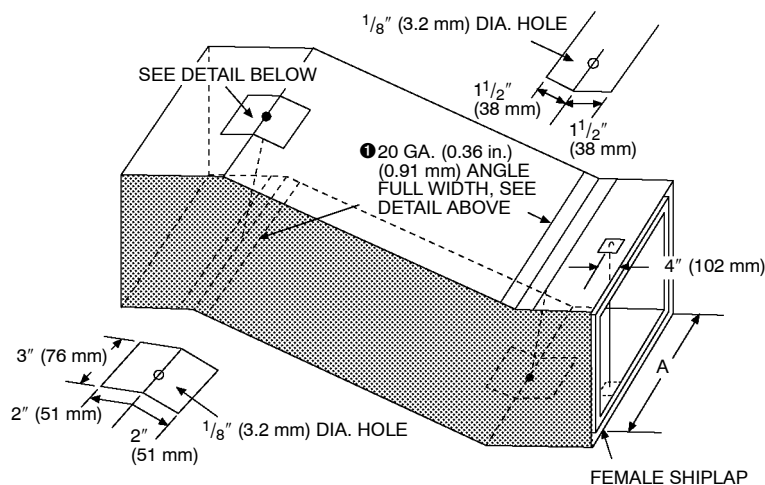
OFFSET REINFORCEMENT WITH SHEET METAL PLATES AND TIE RODS
